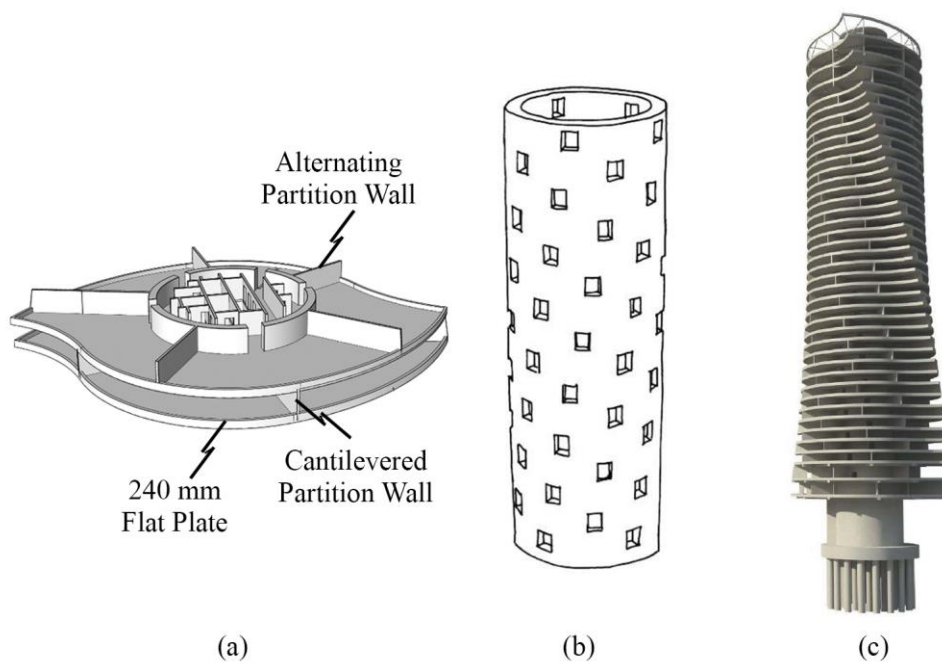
D24 Tower 301; repetitive two-story module (a), switching openings on the core (b) and structural system (c) (Clark & Scott, 2010)
